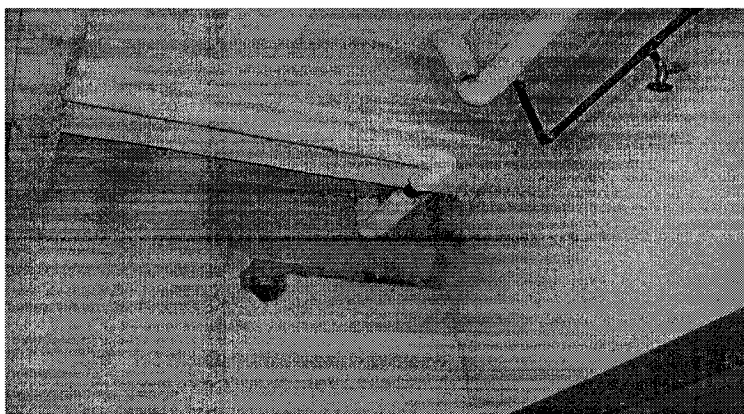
Basement CQB file room; detail of penetrations in wall, ceiling
